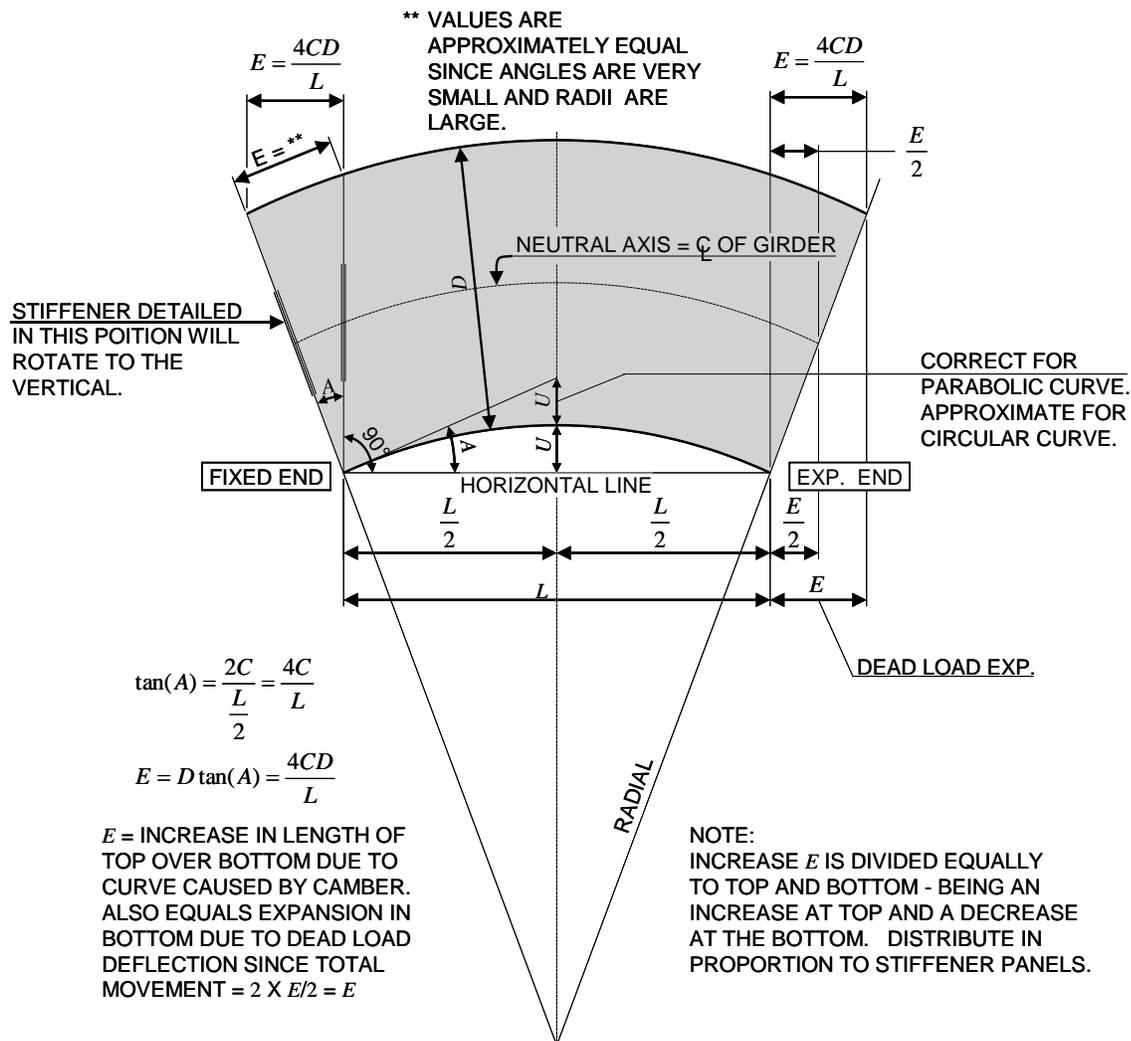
1 Welded girders principles of girder camber calculations
